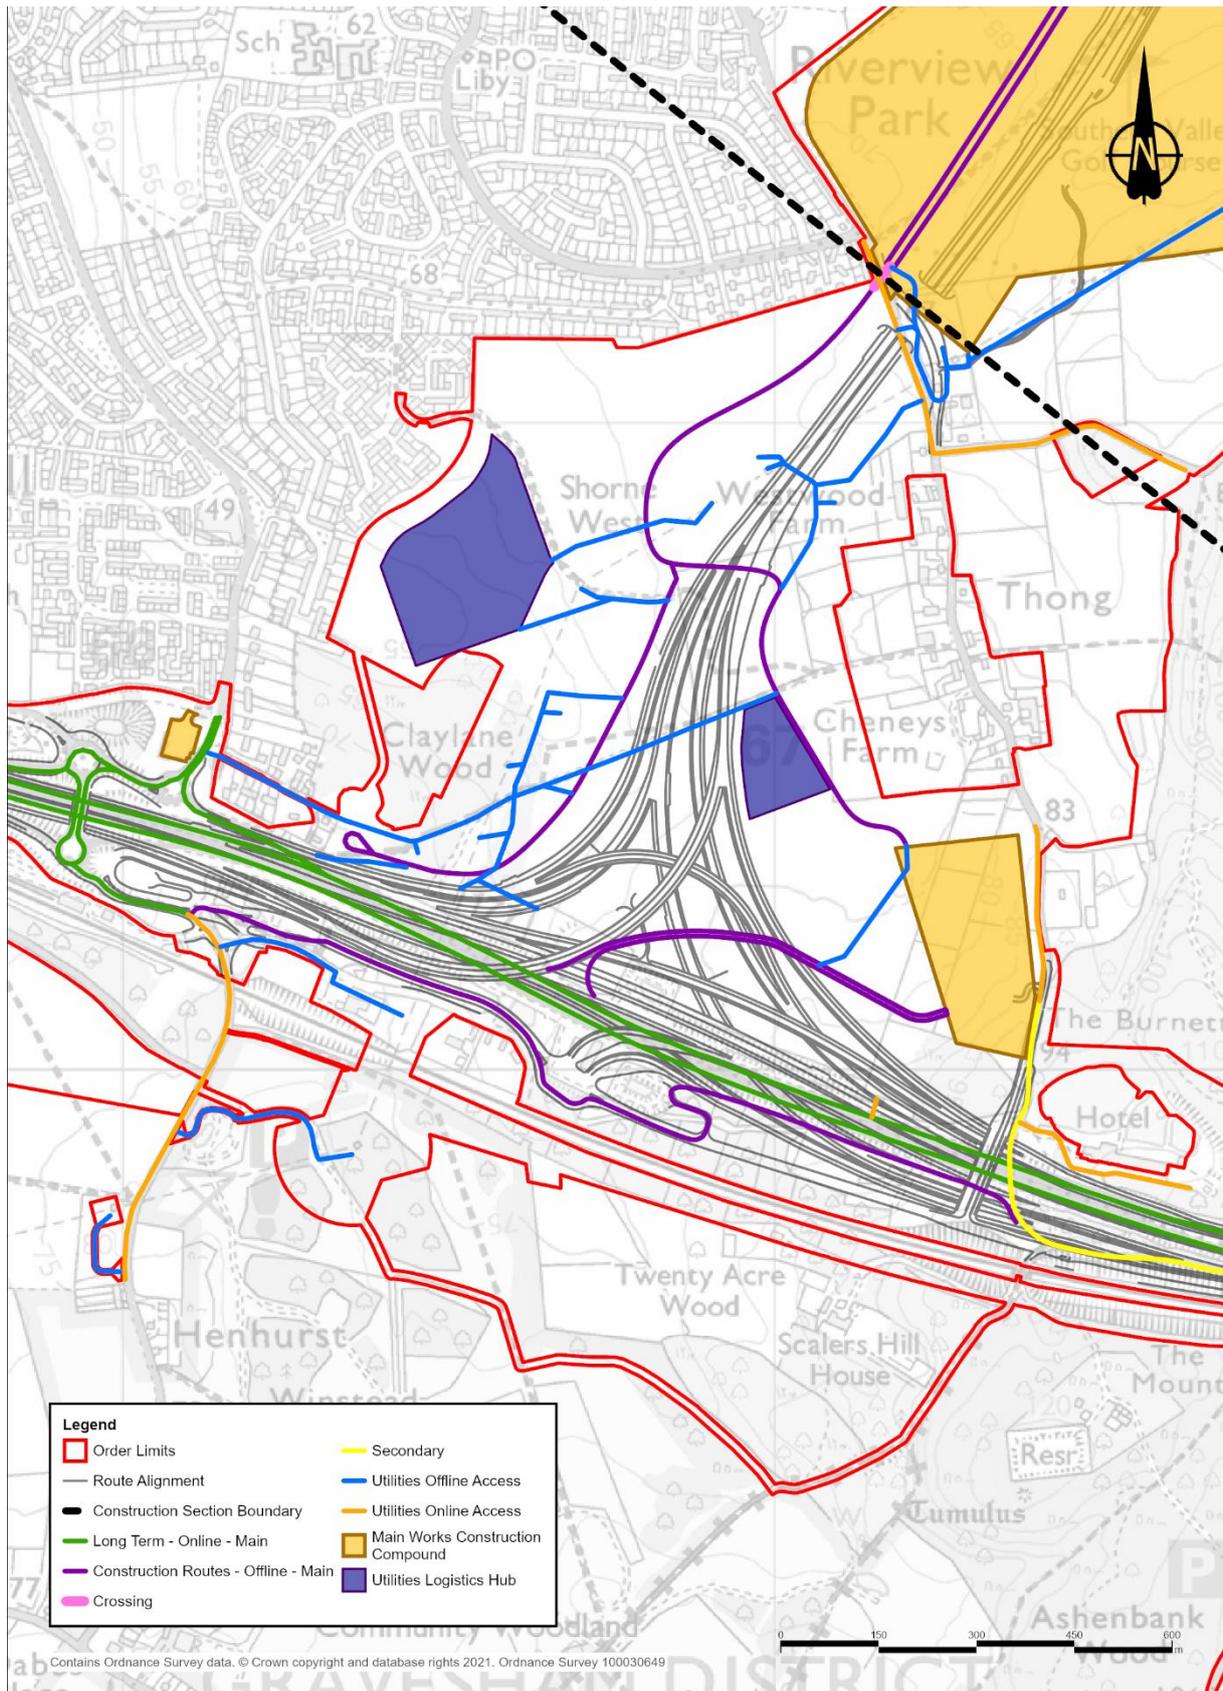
Compounds, ULH and HGV construction traffic routes including Utilities (South Portal to North Portal)
